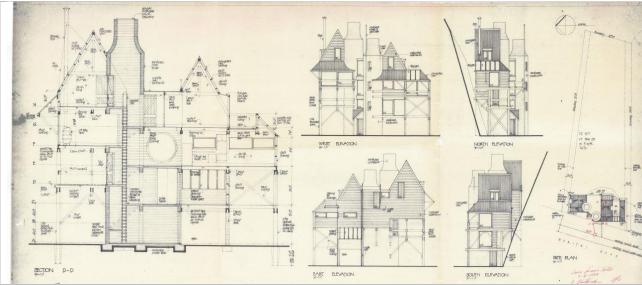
Elevations and site plan for Logan House. Source: HCC Archives
